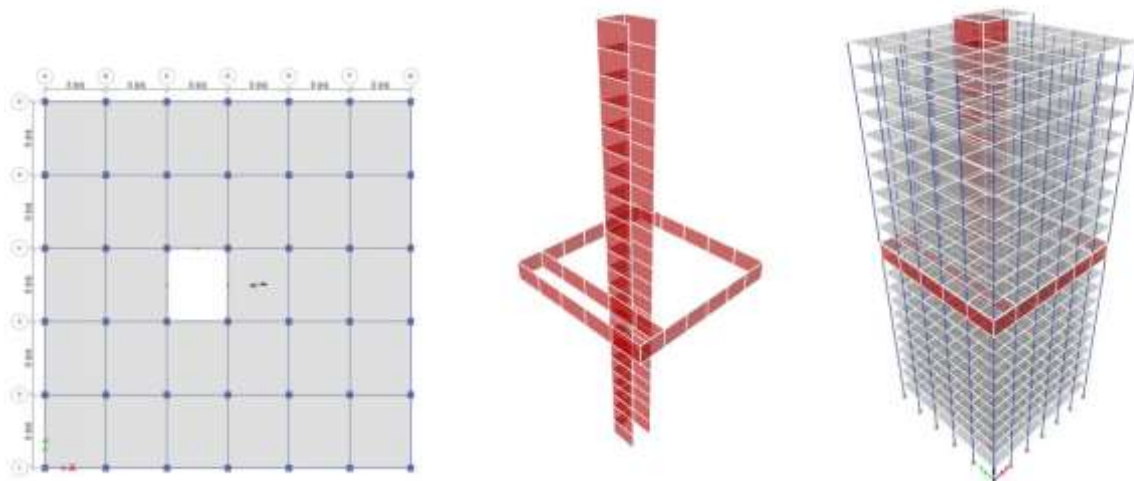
G+20 Storey with Plan, Cut Out View and 3D view
